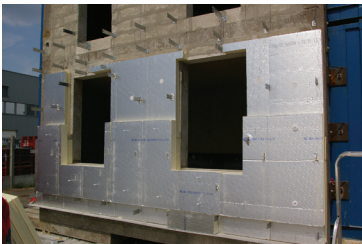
Construction of the façade with PIR insulation for LEPIR 2 test
